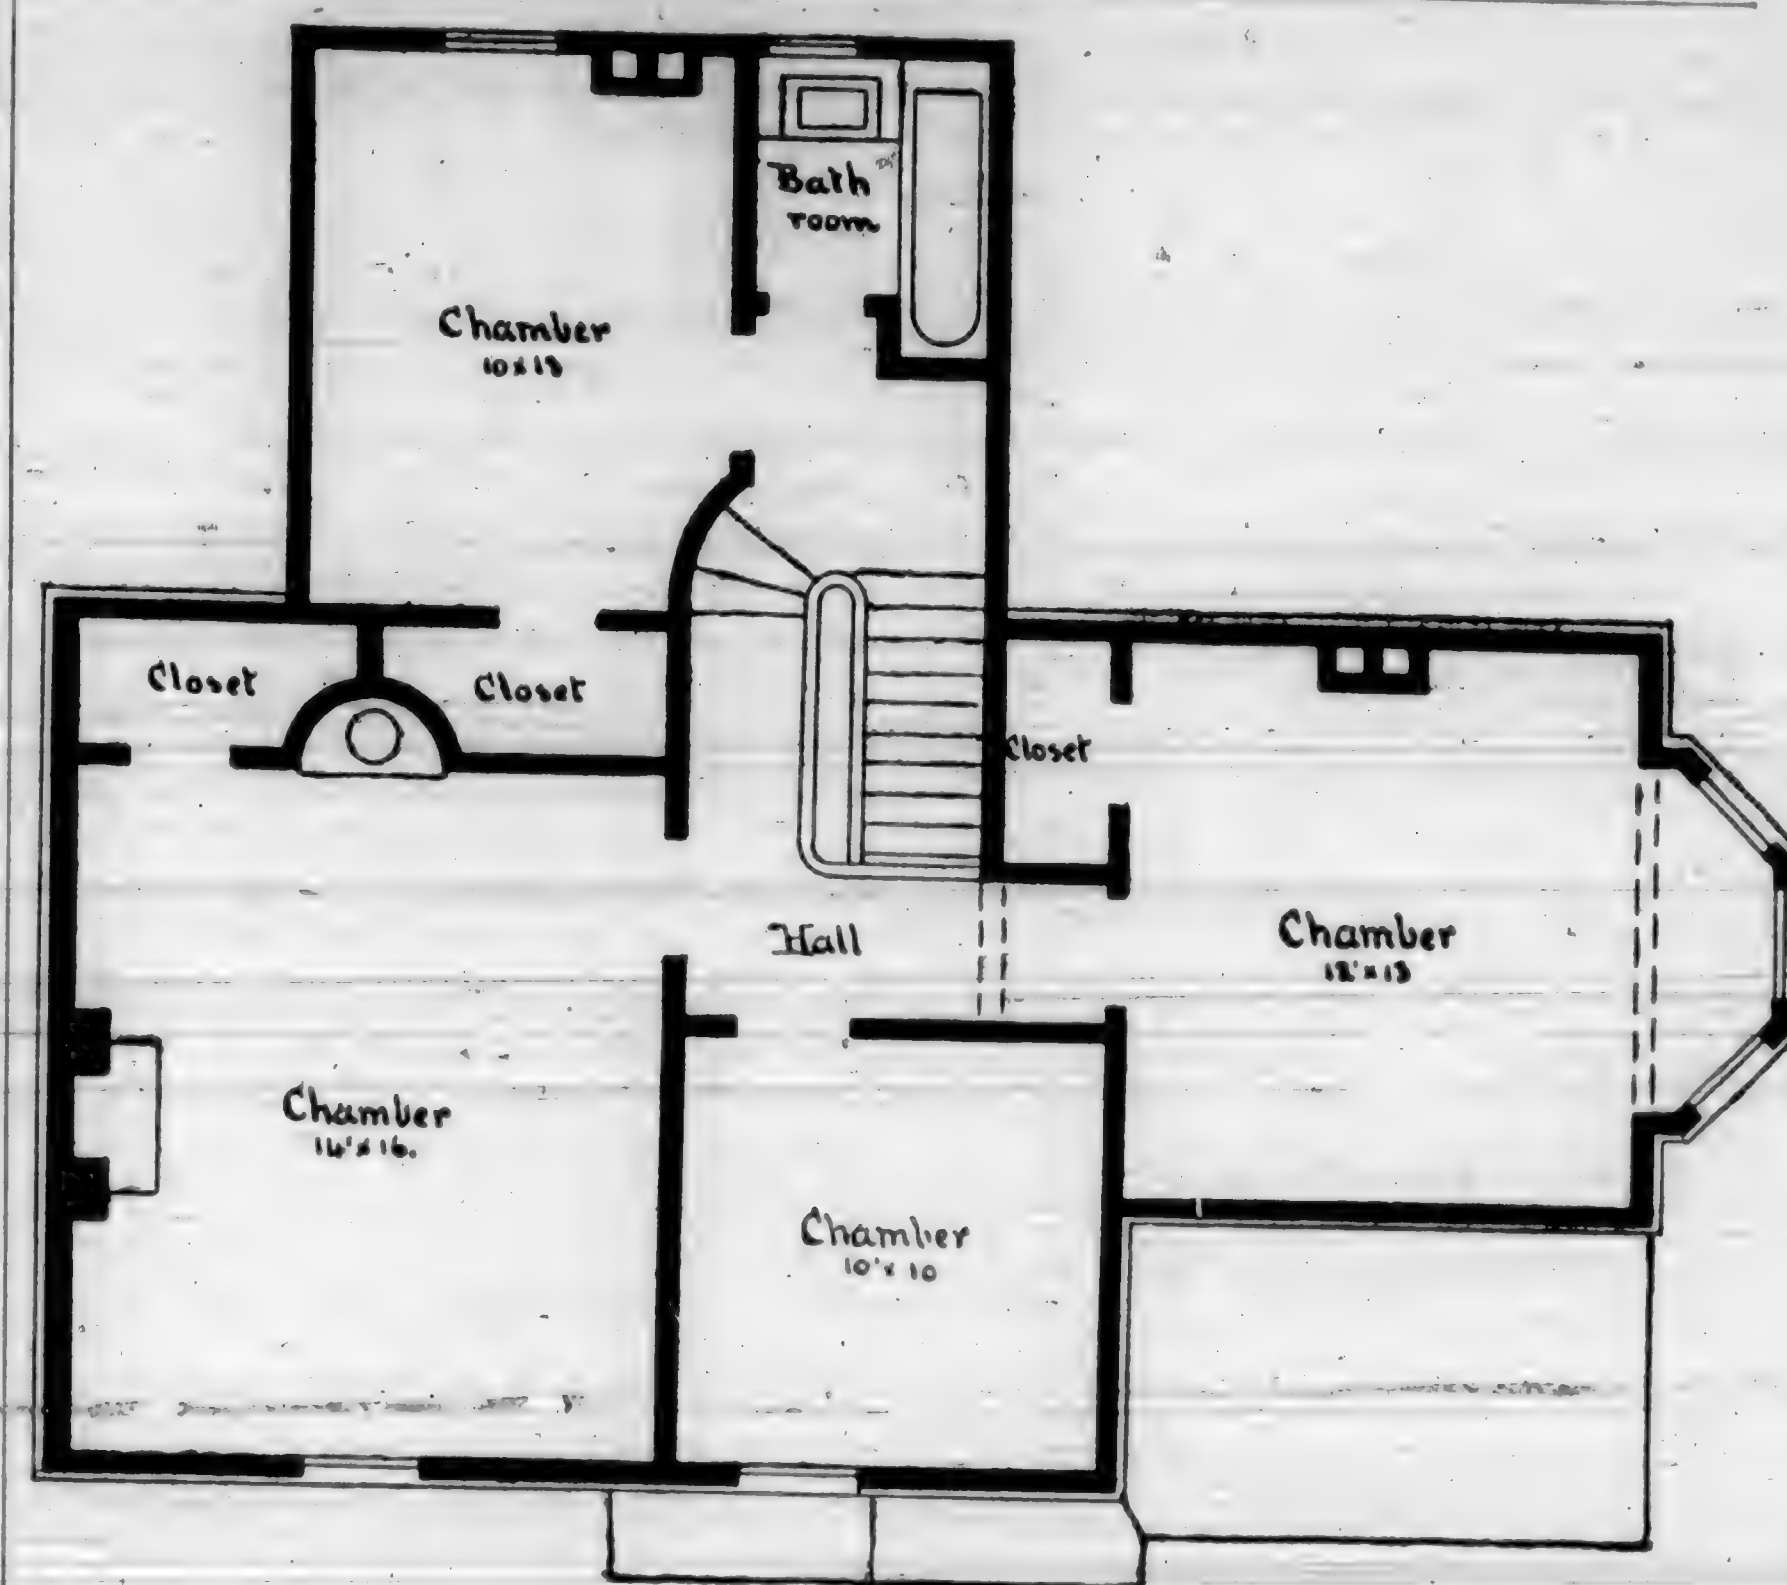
PLATE FOUR.—SECOND FLOOR PLAN OF \$4,000 COUNTRY HOME.
